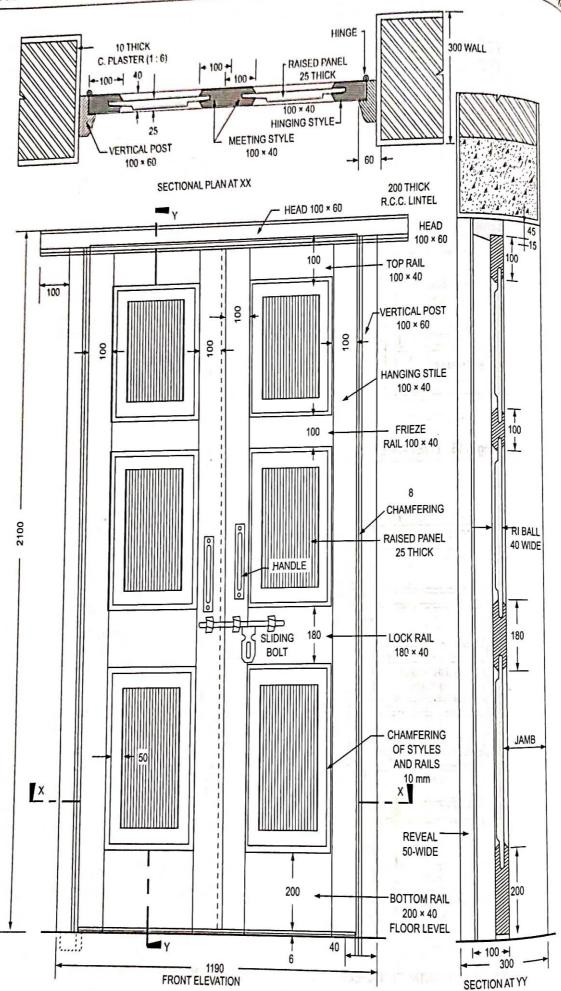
FULLY PANELLED DOUBLE LEAFED DOOR
